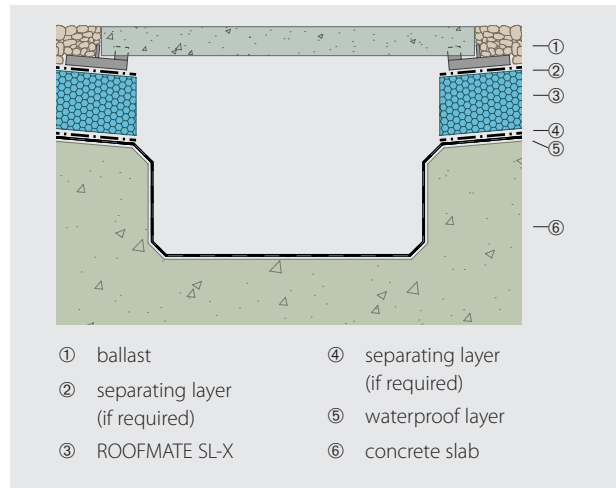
>> Ballasted inverted roof - insulation over internal gutter
